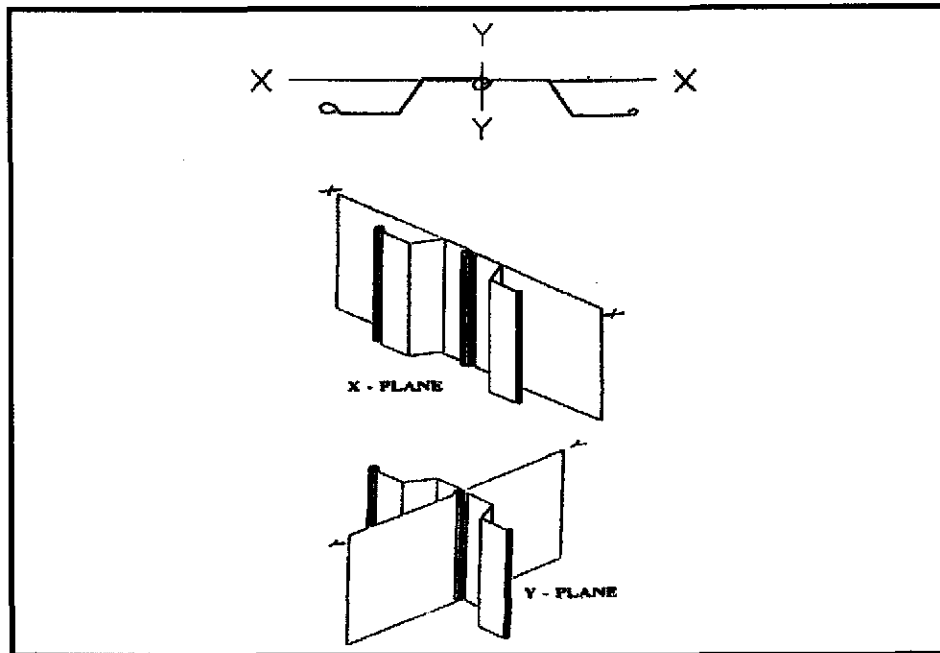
Waterloo Barrier® Sheet Pile Axes
